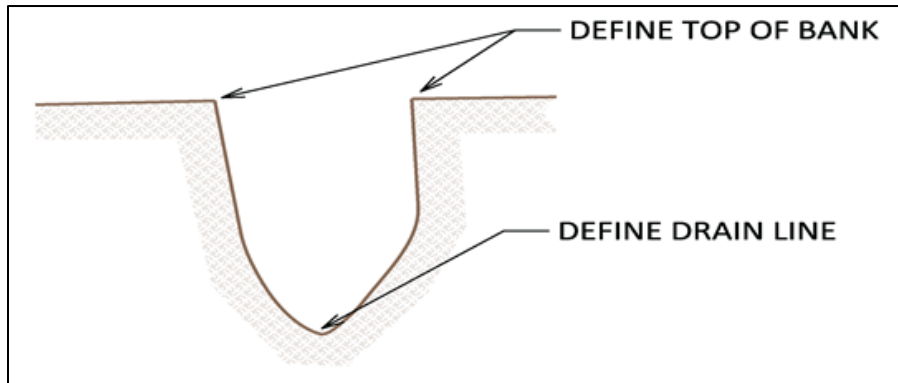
Example Outfall Drainage Survey Detail – Cross Section
